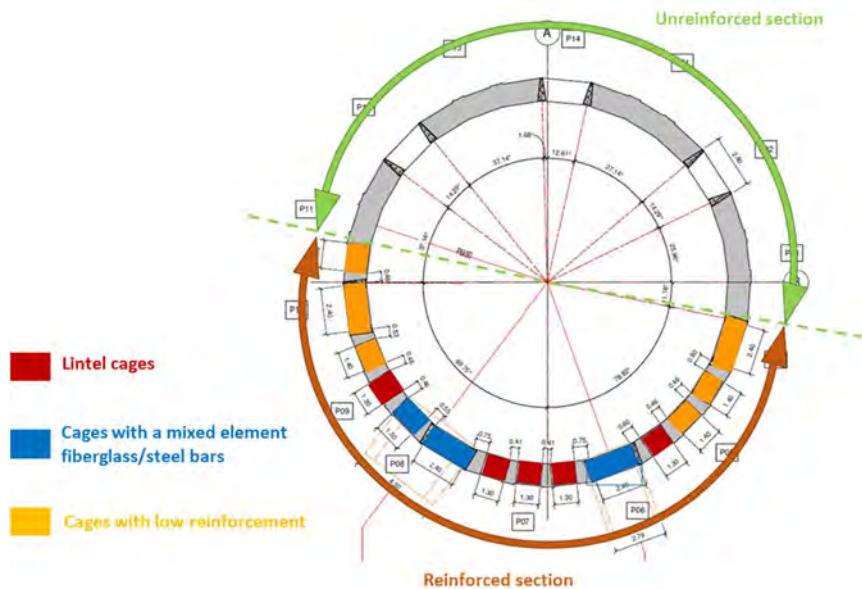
Steel cages and unreinforced section location - © Soletanche Bachy
